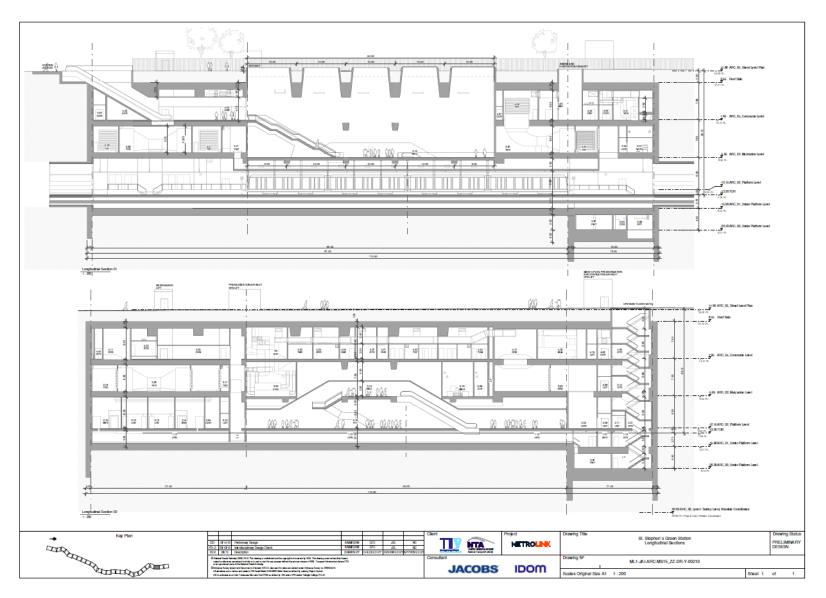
Preliminary Design of St Stephen's Green Station - Long Section
